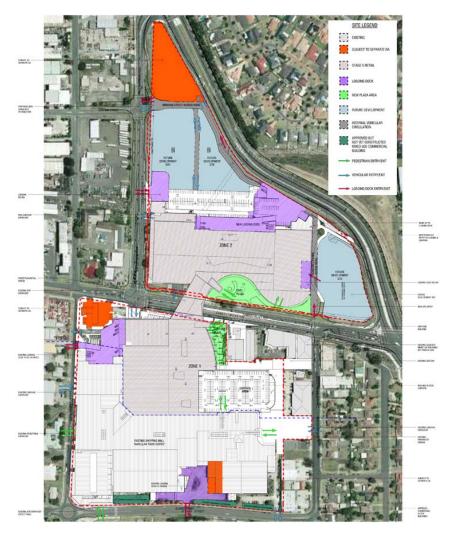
Site Plan Showing Key Elements of Proposed Development.
